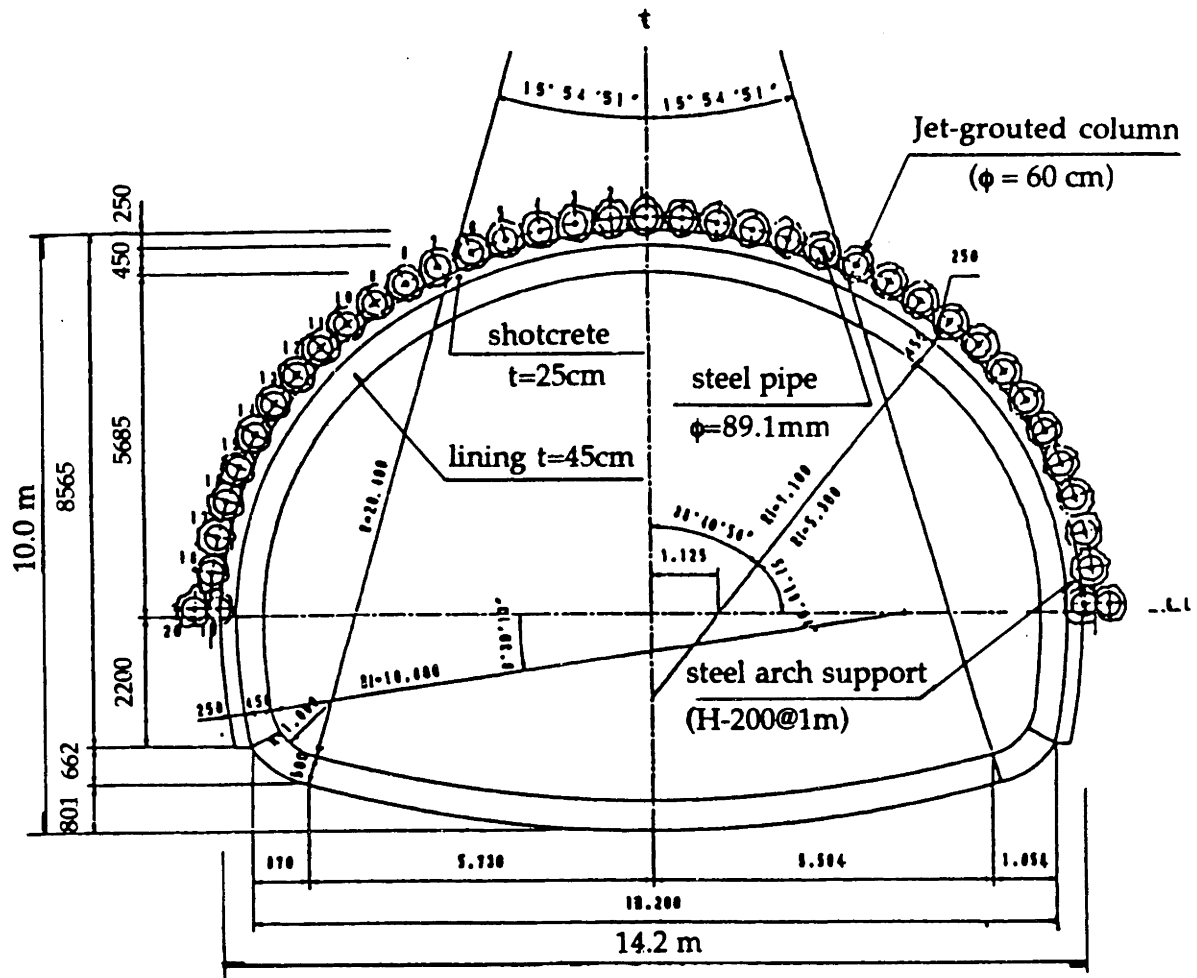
Cross section: Kaziwara No. 1 Tunnel (Ae et al., 1992)
